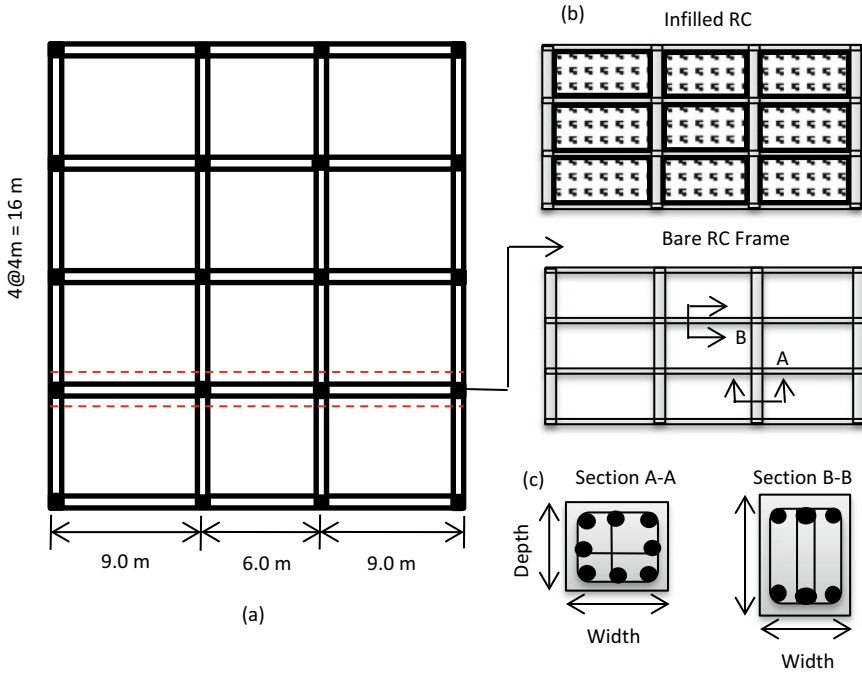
RC frame buildings; a Frame plan, b Frame elevations and types and c Typical columns and beams detailing
